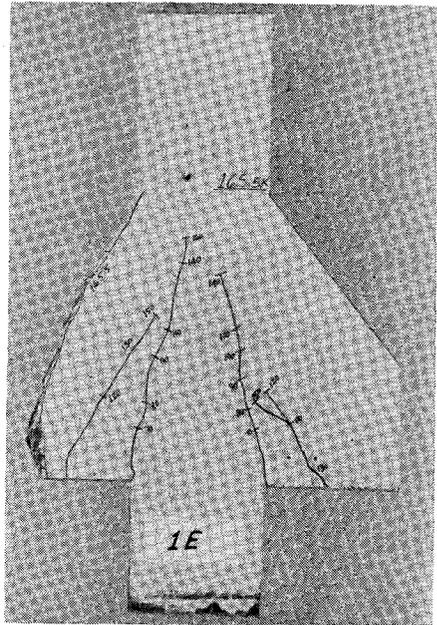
Conventionally Reinforced Corbel, Type B1, Loaded Near Outer Edge. Failure Plane Follows Bend Radius
